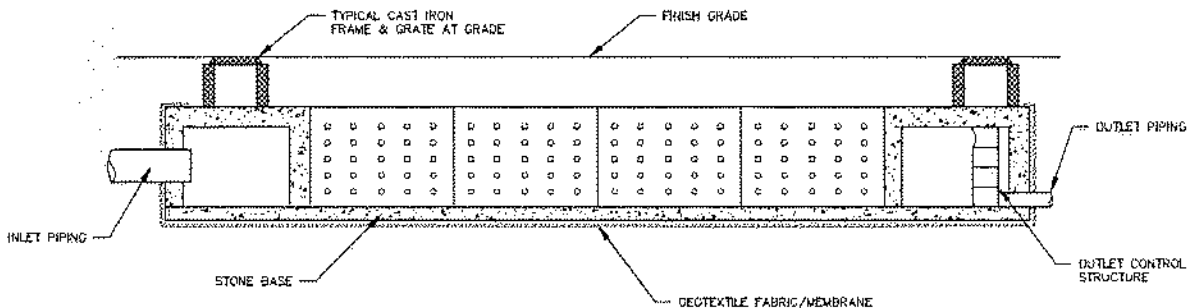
Schematic Drawing of Typical Precast Storage Gallery (not to scale)
